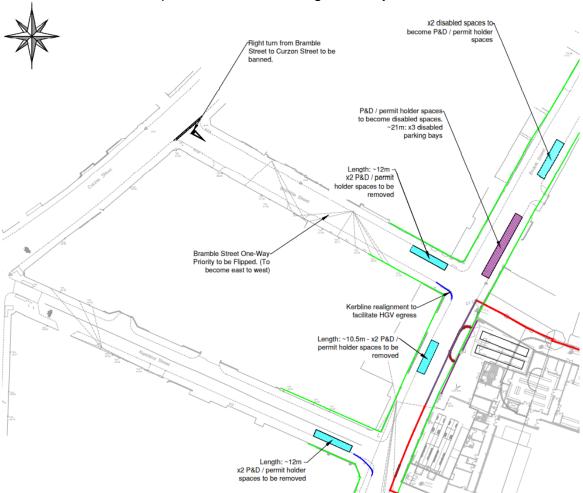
Proposed Highway Changes around Newland Street and Bramble Street.
